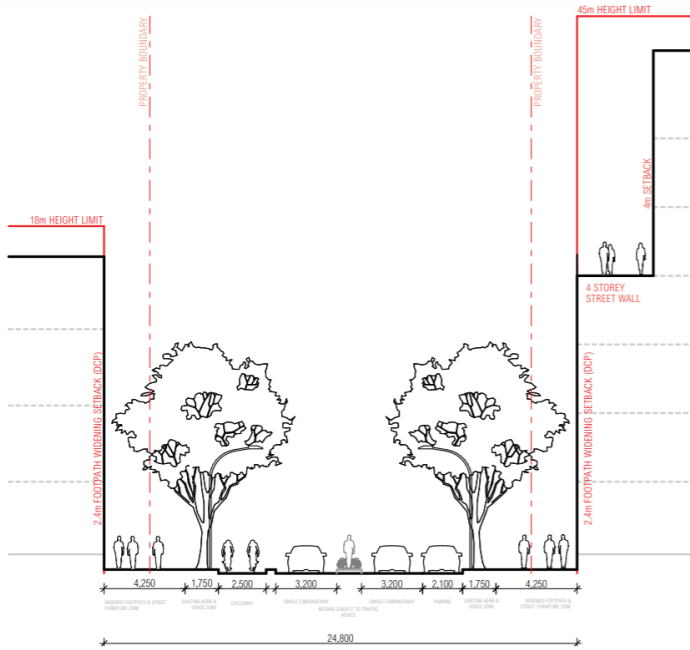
Indicative street section – Bourke Street (B), North Alexandria
